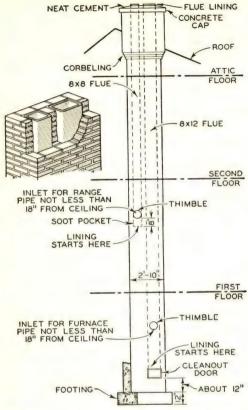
Elevation View of Chimney in Figs. 20 and 21, Showing Flues
